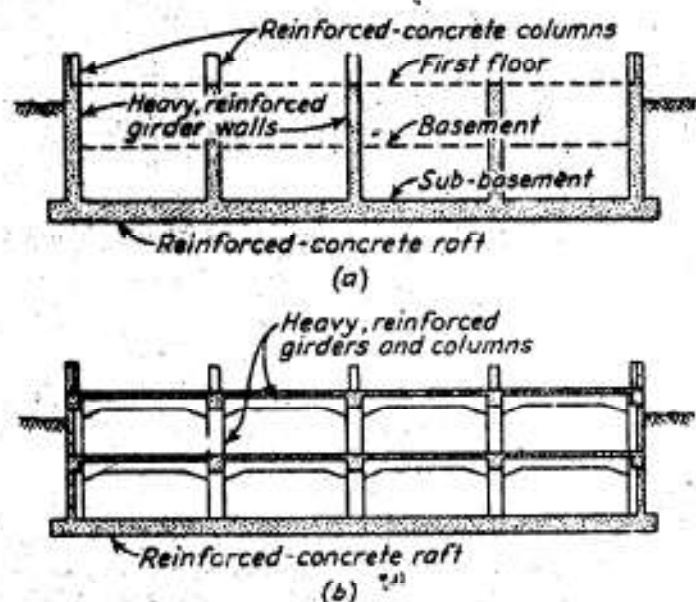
Methods of stiffening large raft foundations. (a) Use of ribs or walls as T beams. (b) Rigid-frame construction.
